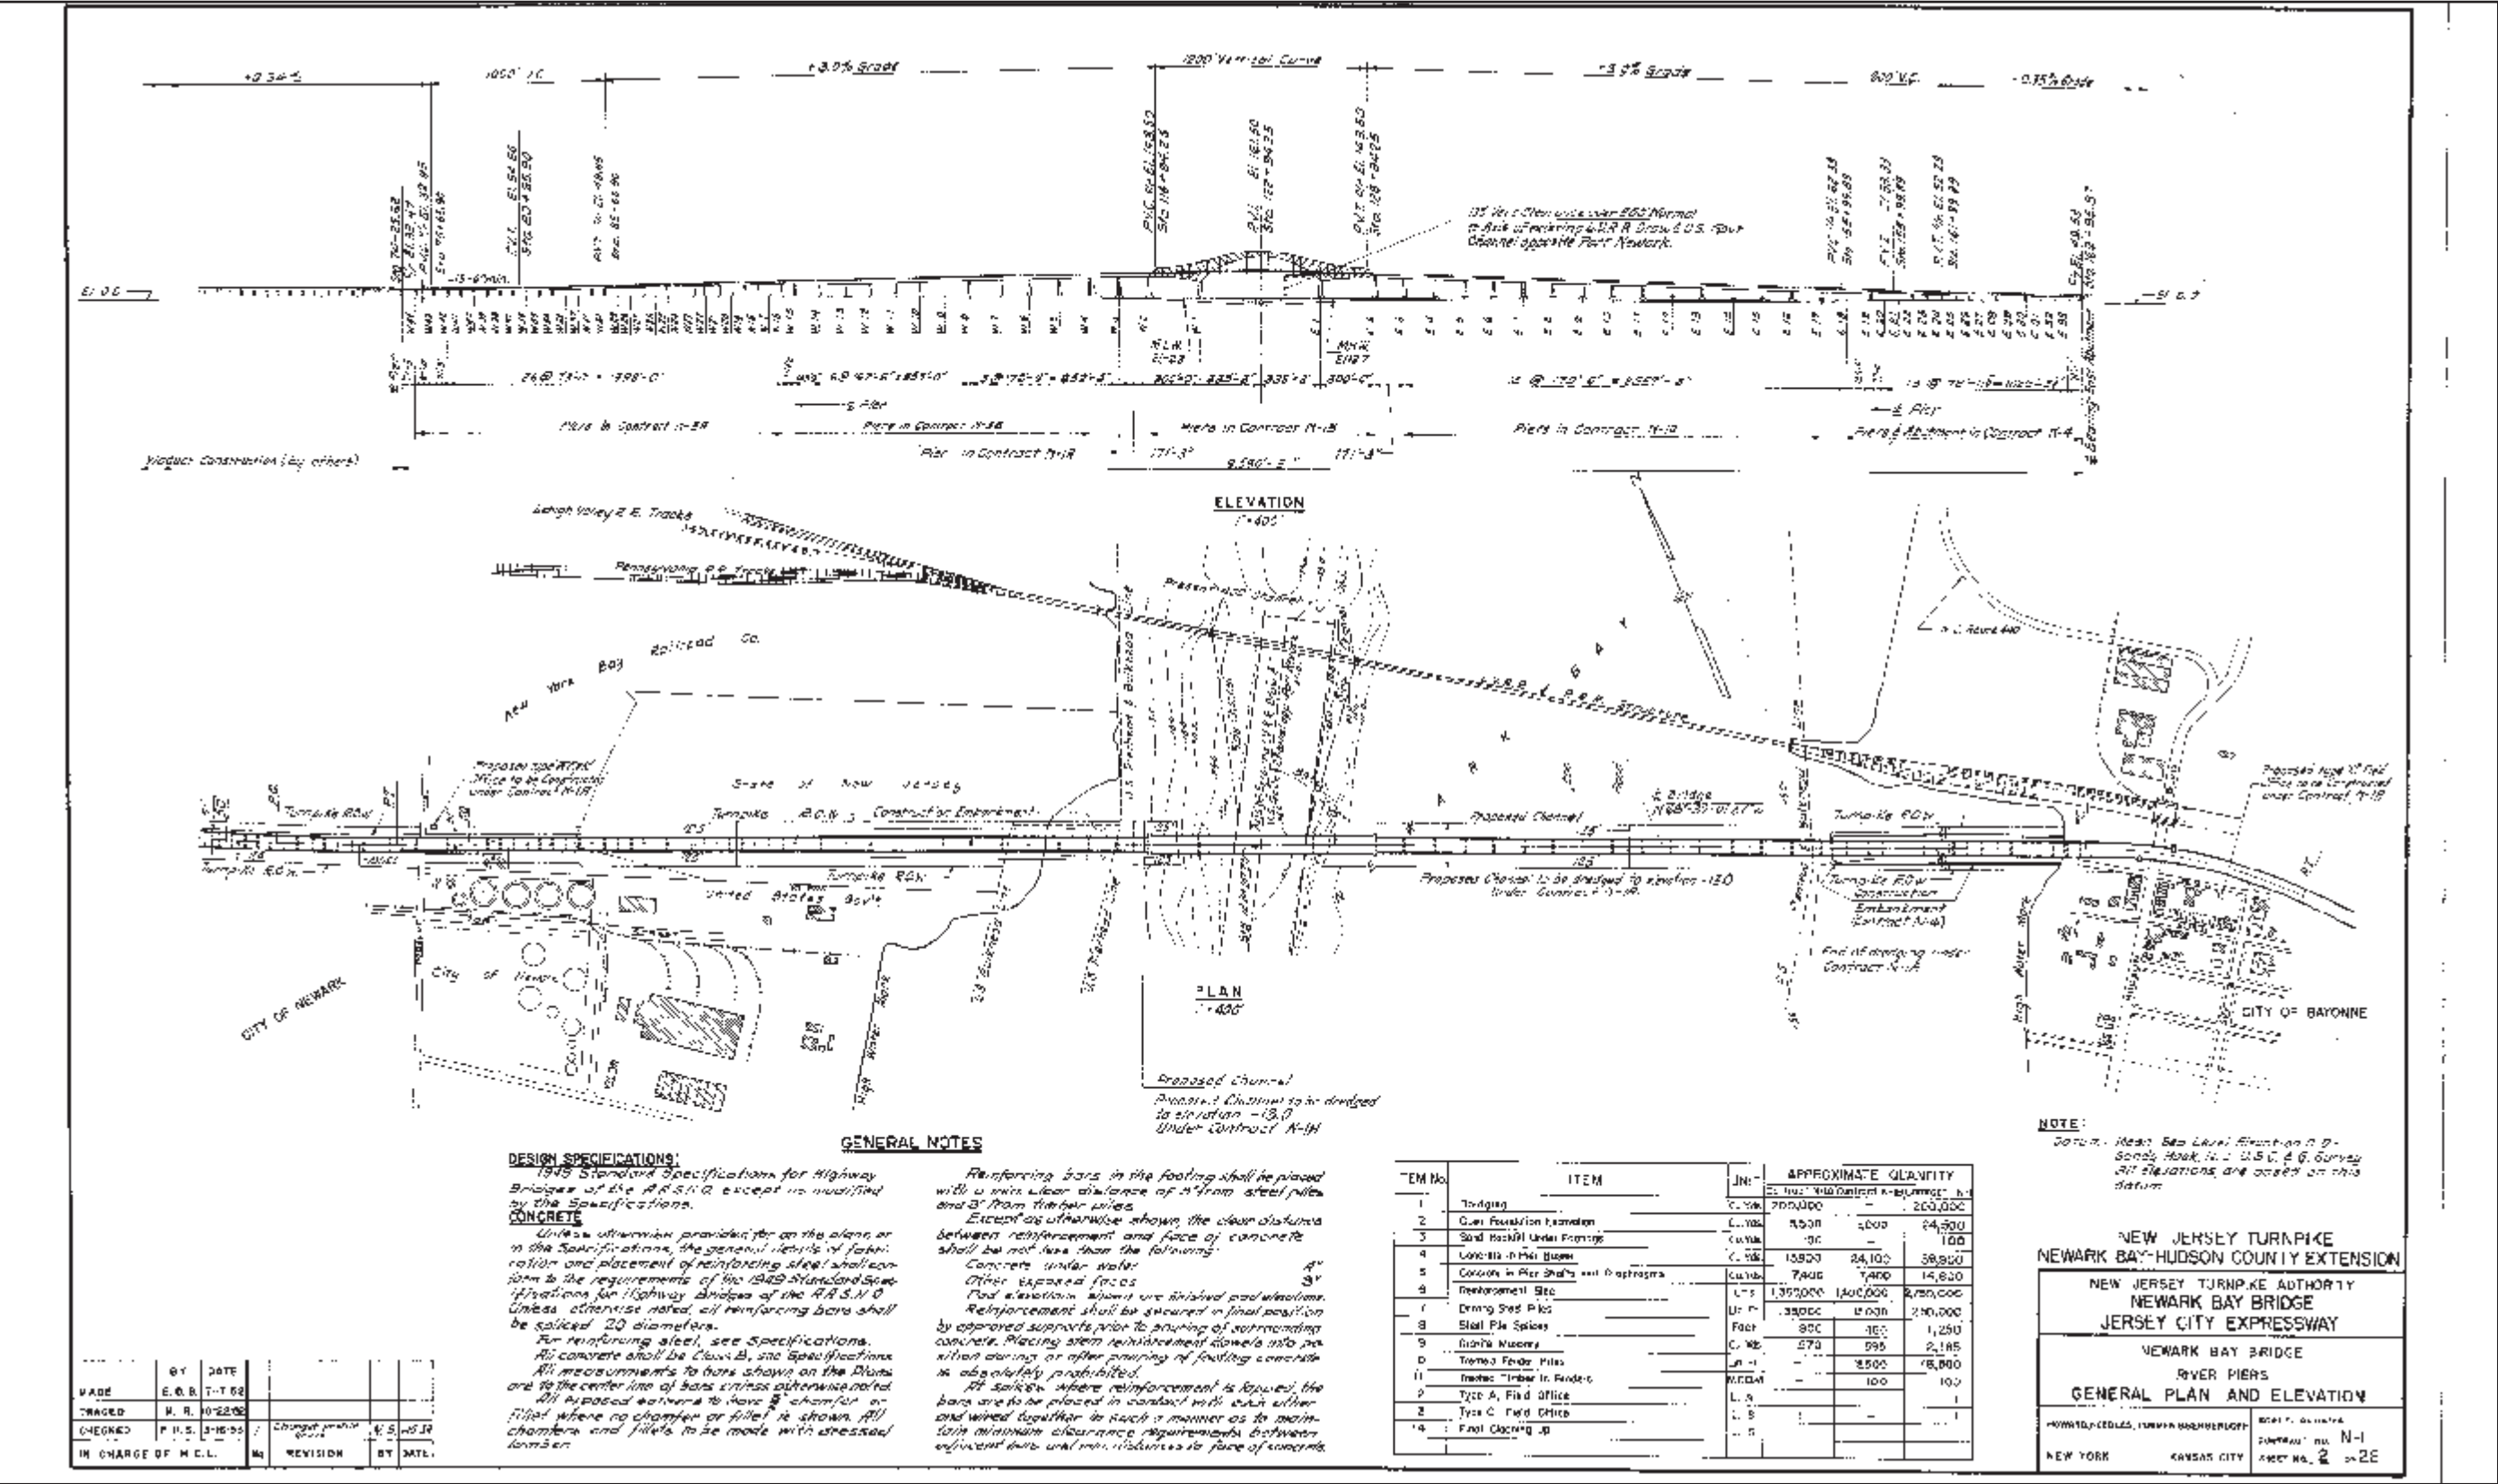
1952 construction drawing showing the general plan and elevation of the Newark Bay Bridge (HNTB 1952).
